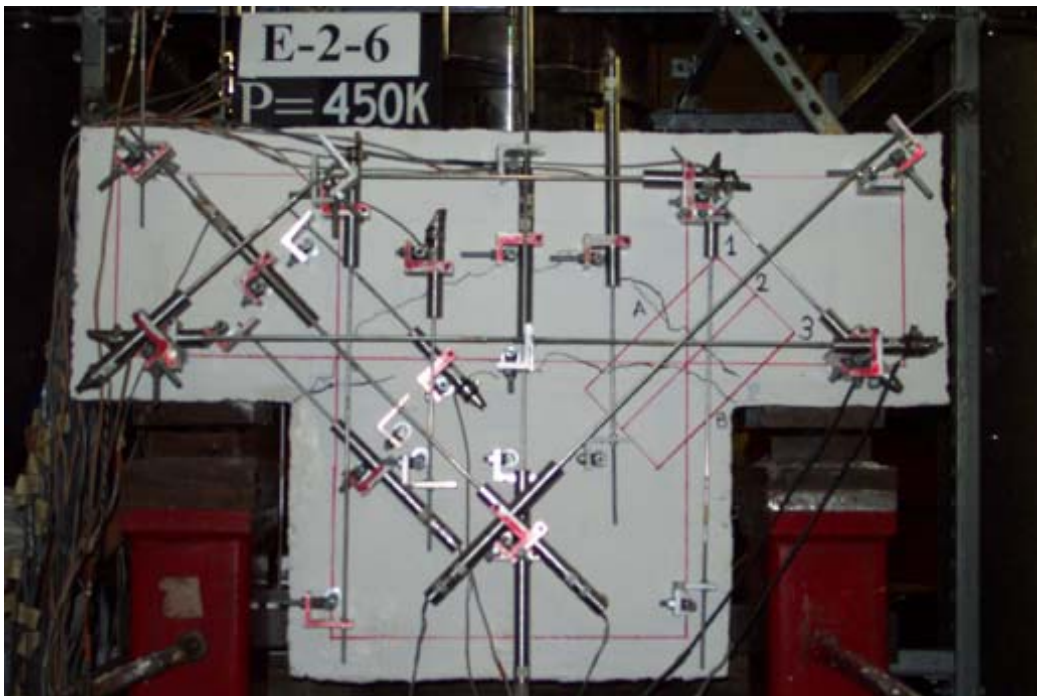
(b) Diagonal and horizontal cracks in Specimen E-2-6
